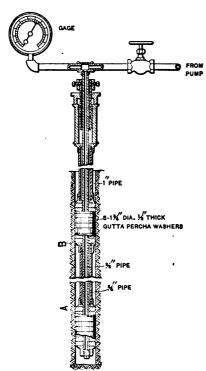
Apparatus for testing holes in foundation of Olive Bridge dam.
